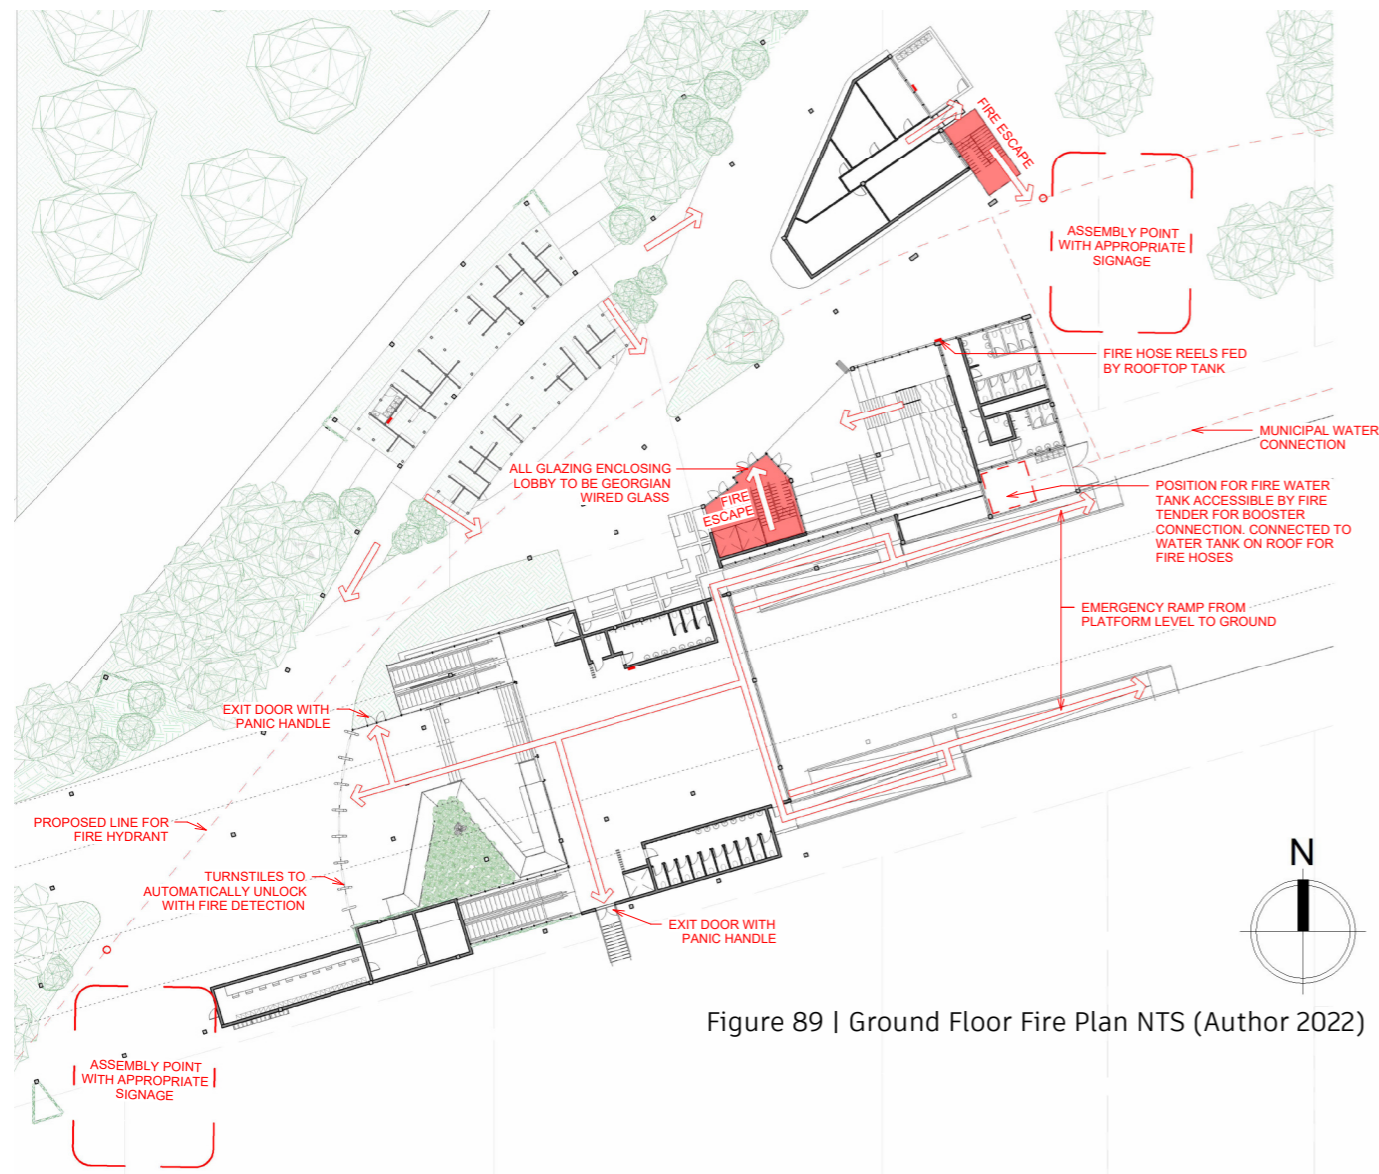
| Ground Floor Fire Plan NTS (Author 2022)
